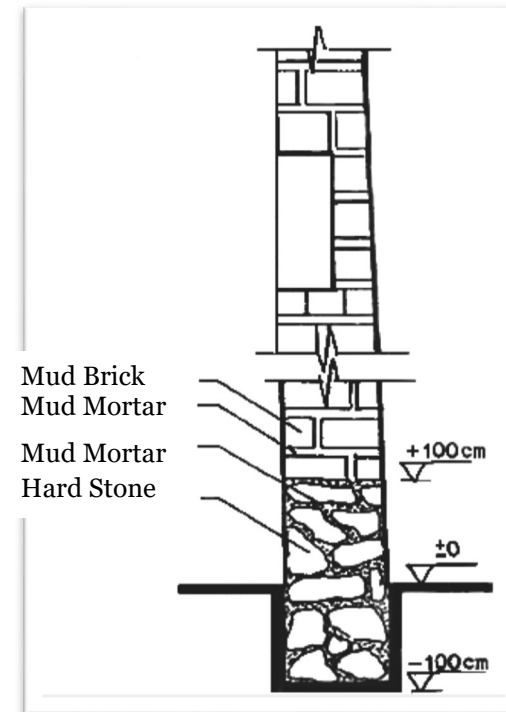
Section in the wall and foundation of traditional building (Ghadames report, 1980).
